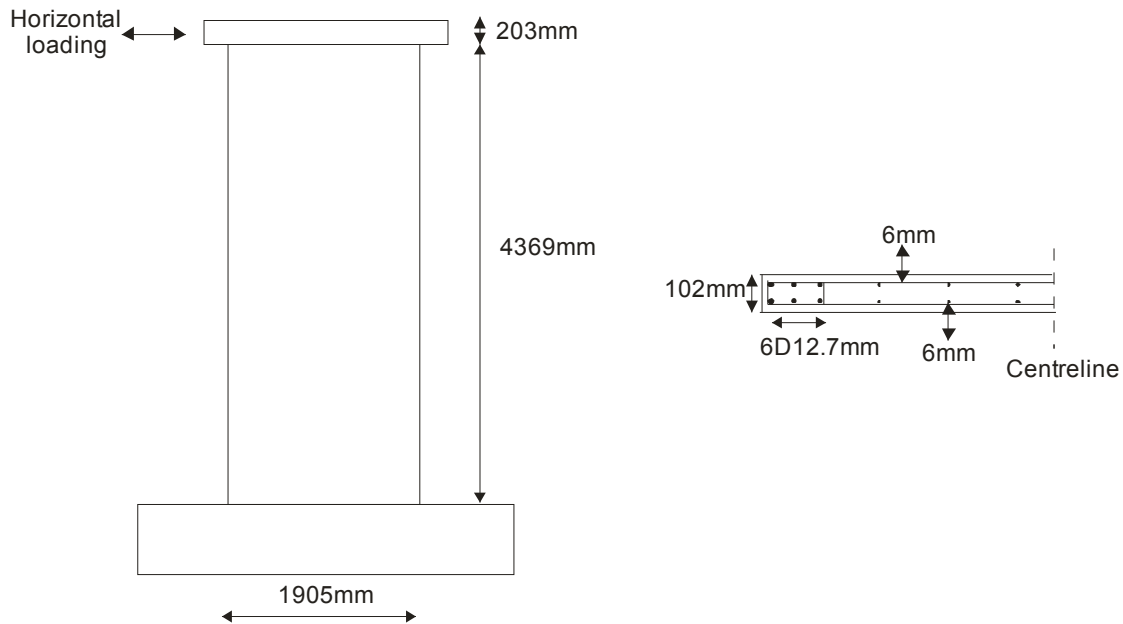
Wall geometry and reinforcing details for Oesterle R2
